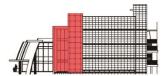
Installation area of operable interior blind for the south elevation of atrium
